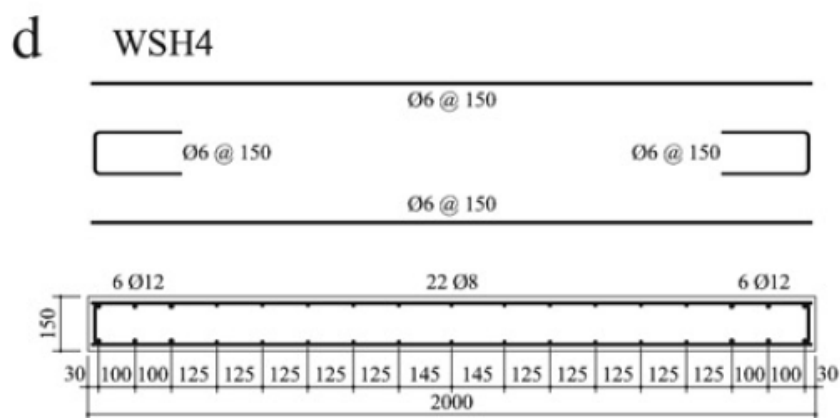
Transversal reinforcement details of WSH4 [DBB09].
